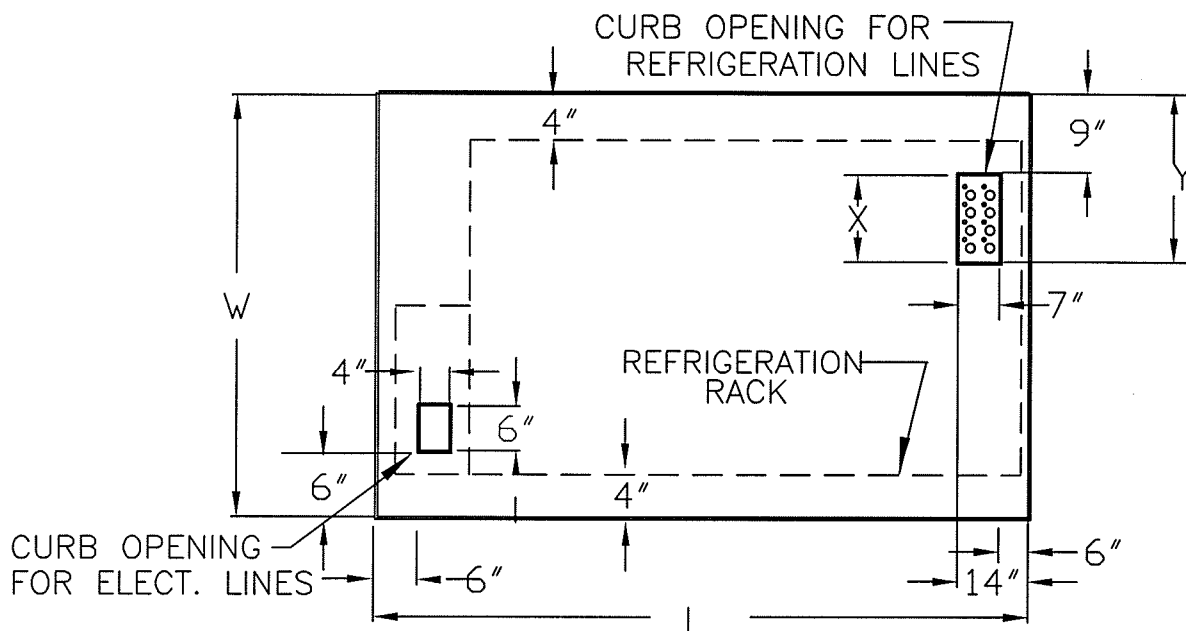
REFRIG-O-PAK RIGGIN DRAWING
